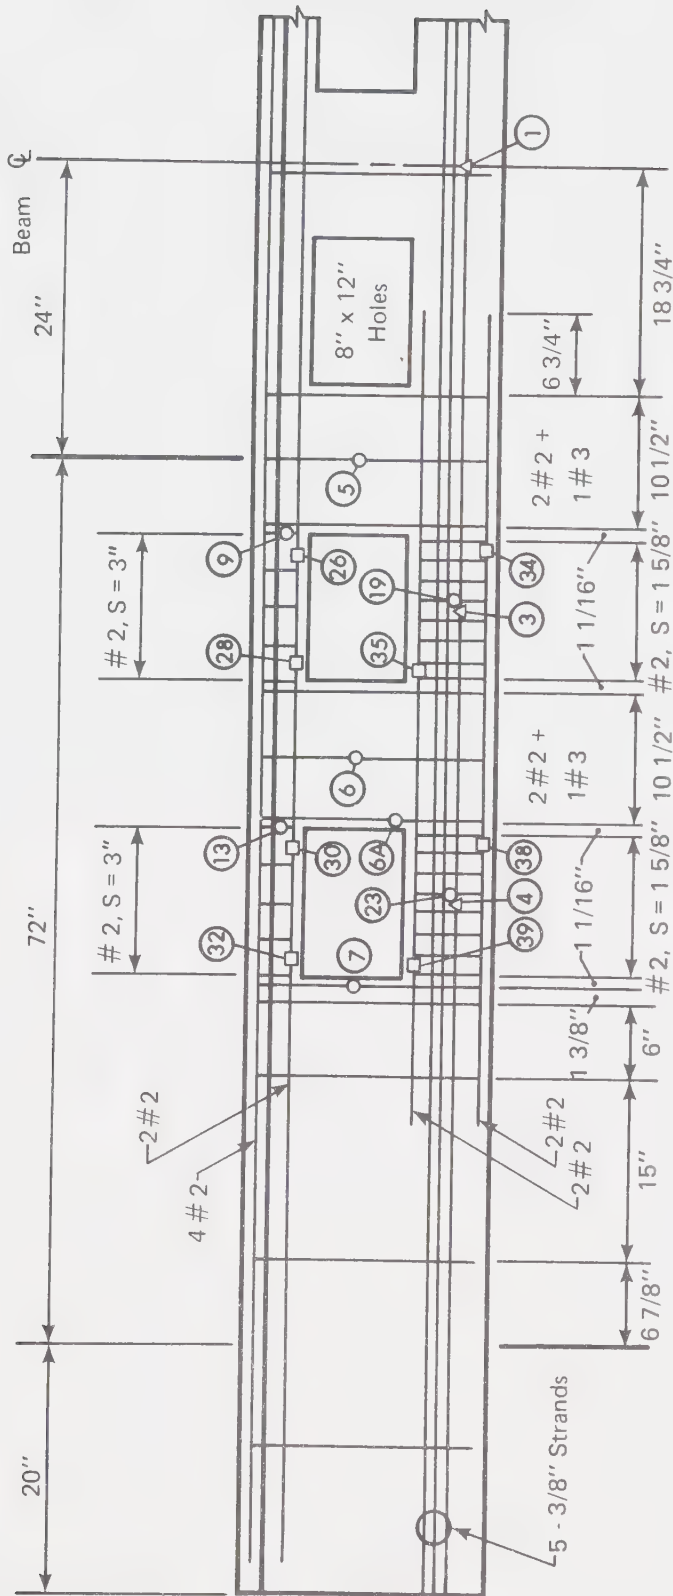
Reinforcement Details and Strain Gage Locations for Beam 29-12-6
